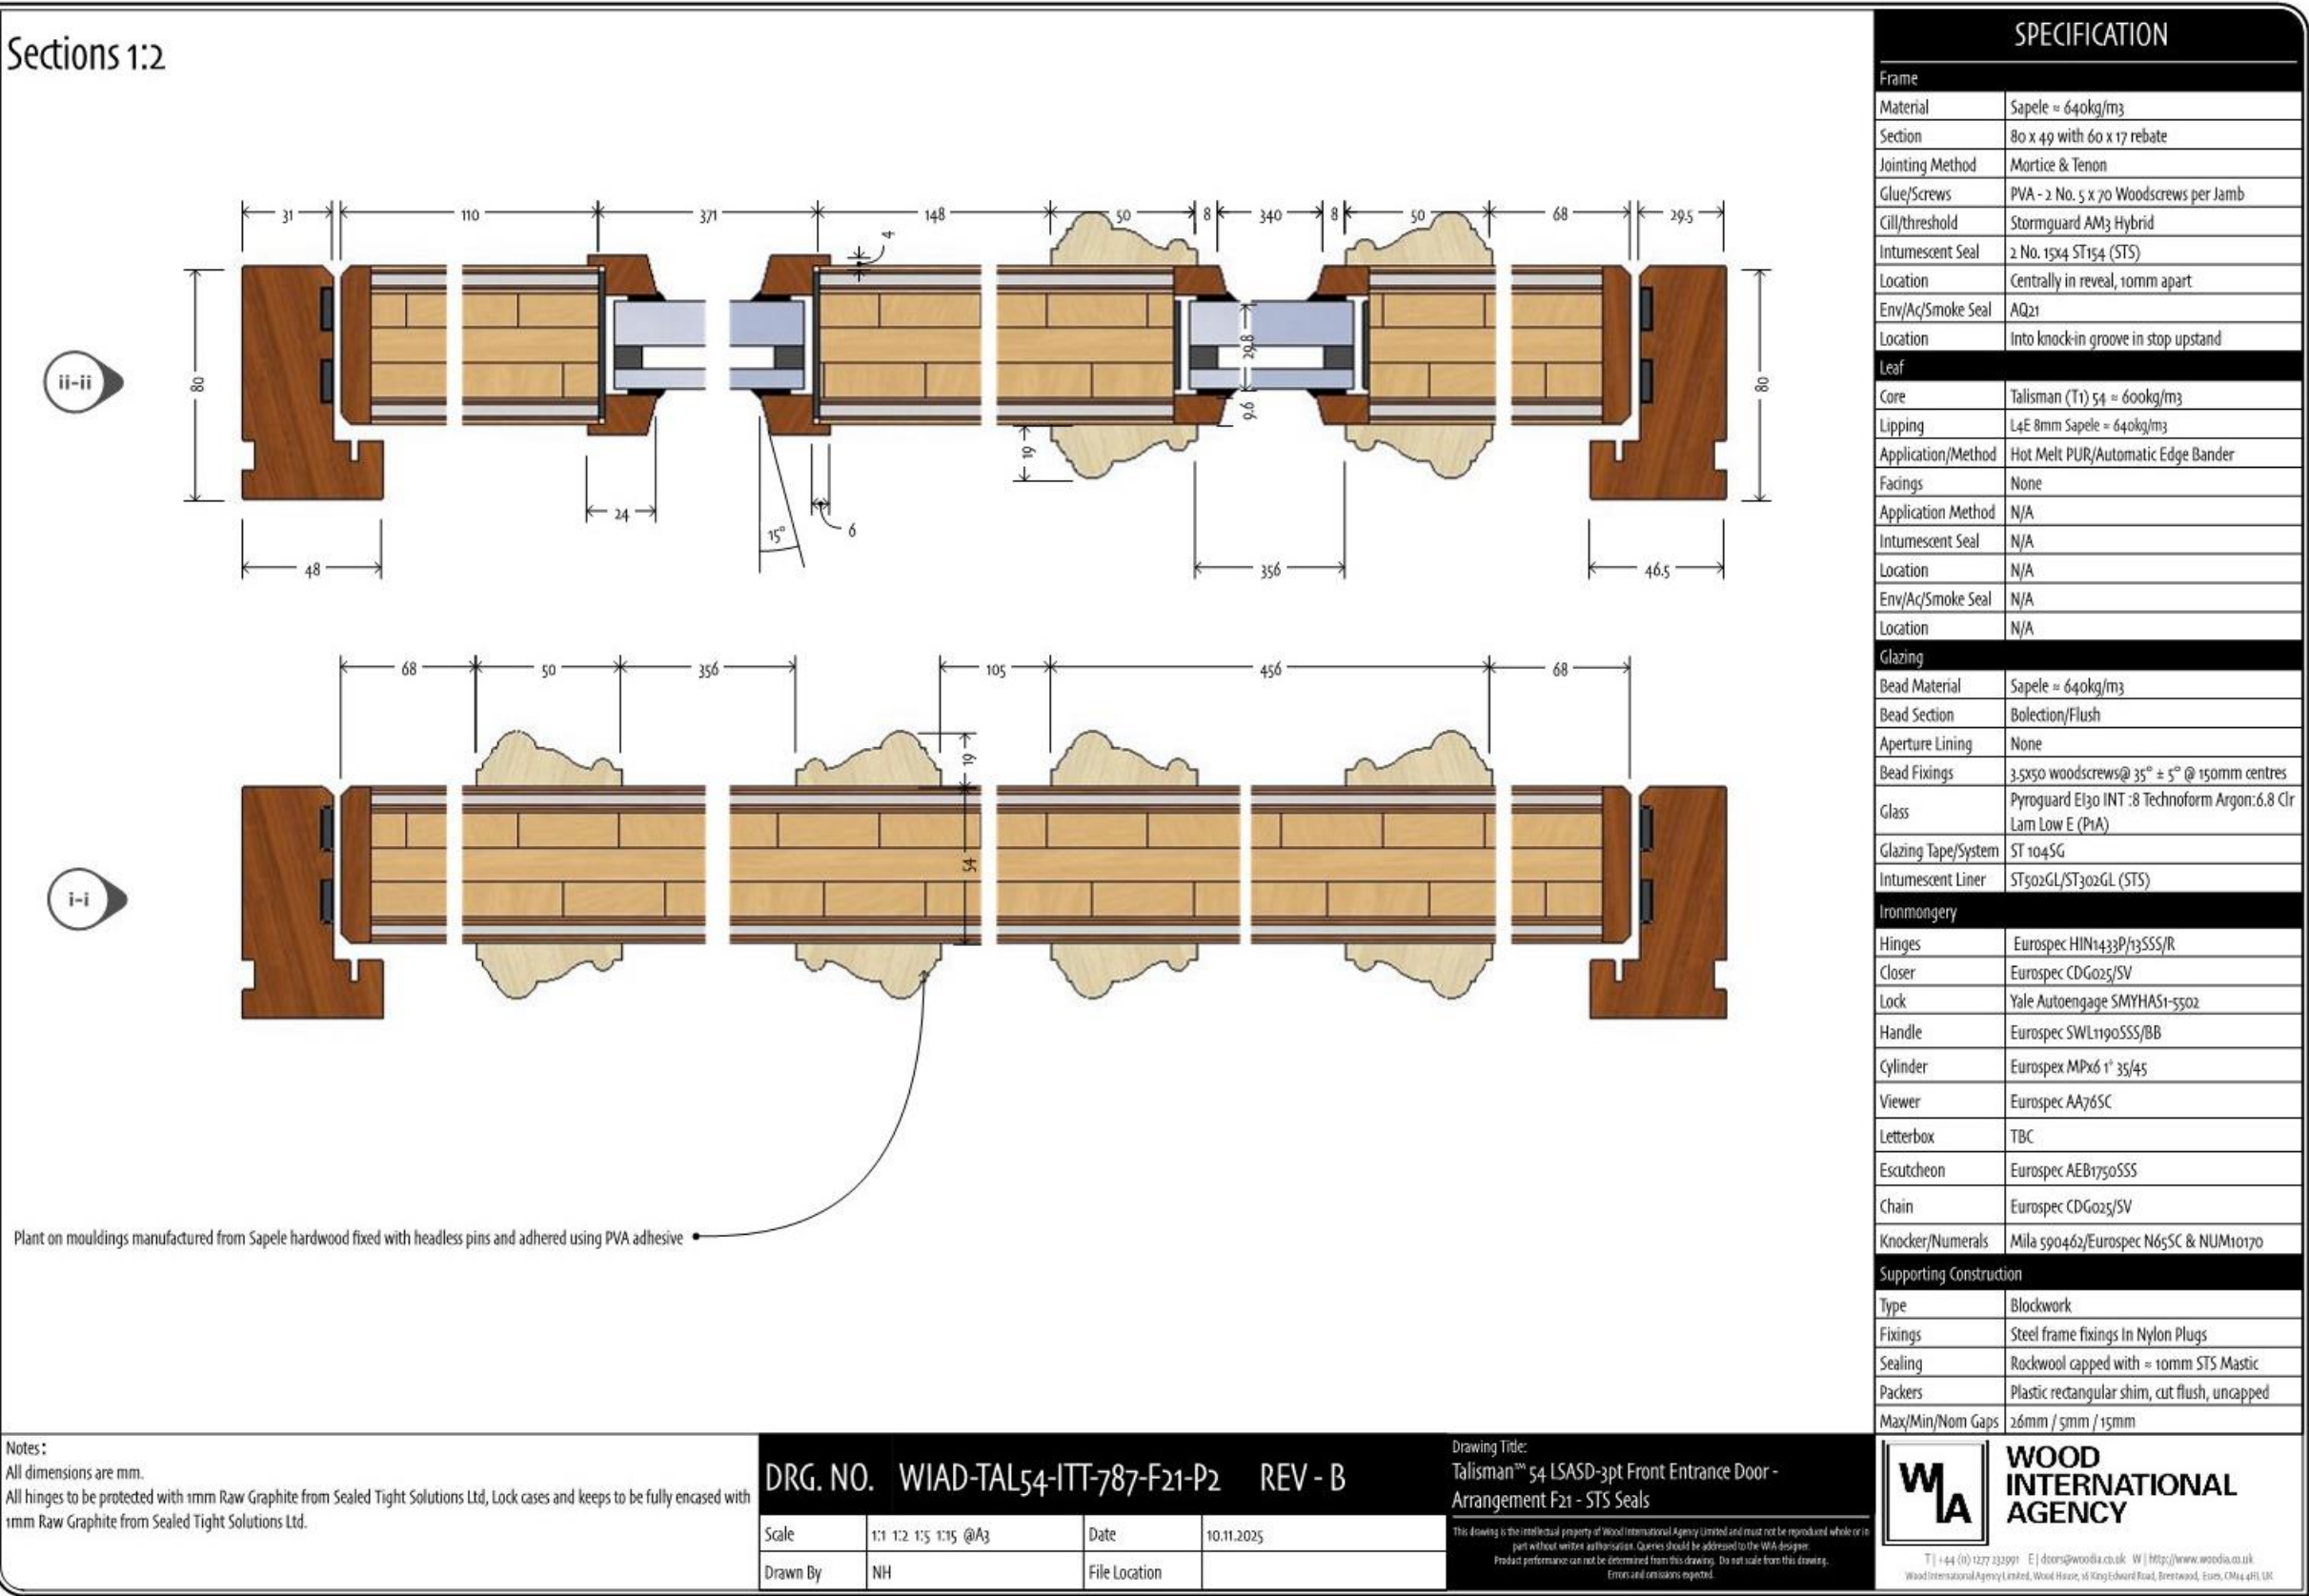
Drawing WIAD-TAL54-ITT-787-F21-P2 Rev B
